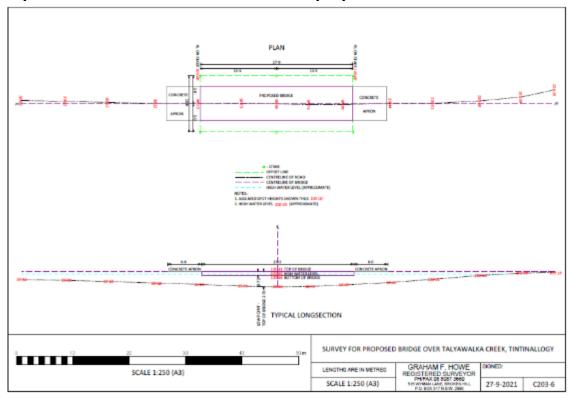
Architectural Drawings/ structural dwgs for installation of preconstructed bridge over Talywalka Creek at Lot3995 in DP 766468, Teryawynia Station,
